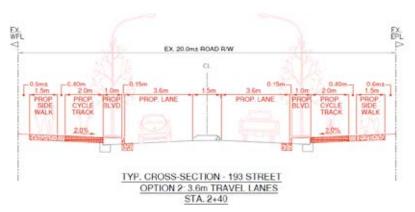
COMPLETE STREET CROSS-SECTION
